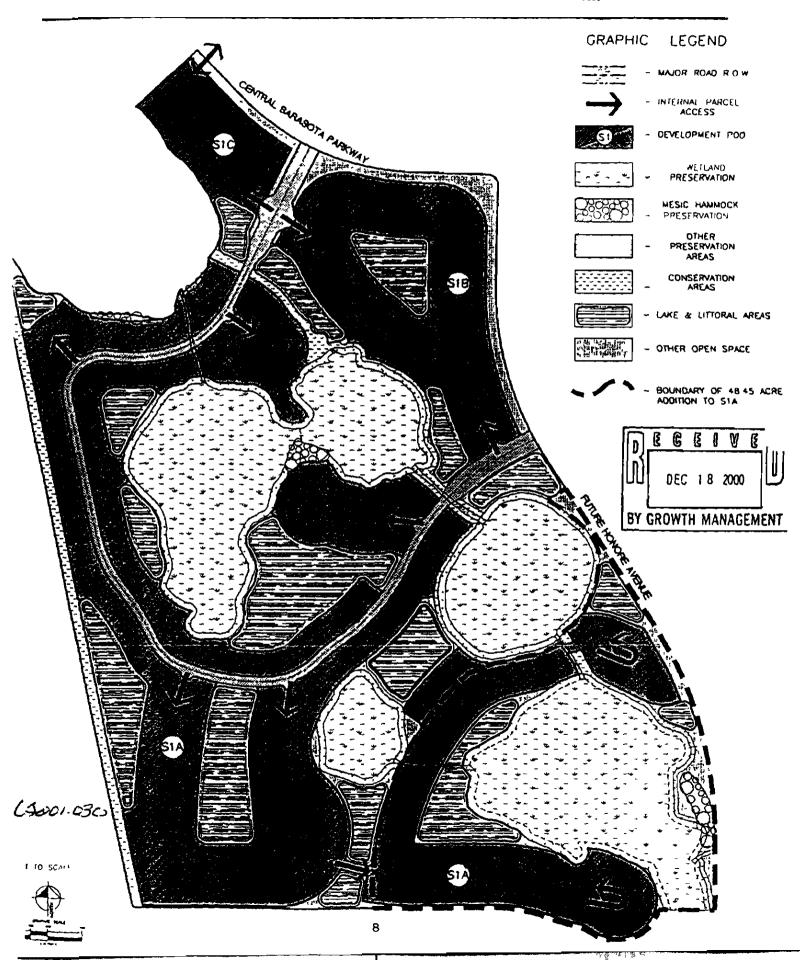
EXHIBIT C - MASTER DEVELOPMENT PLAN FOR INCREMENT XI
